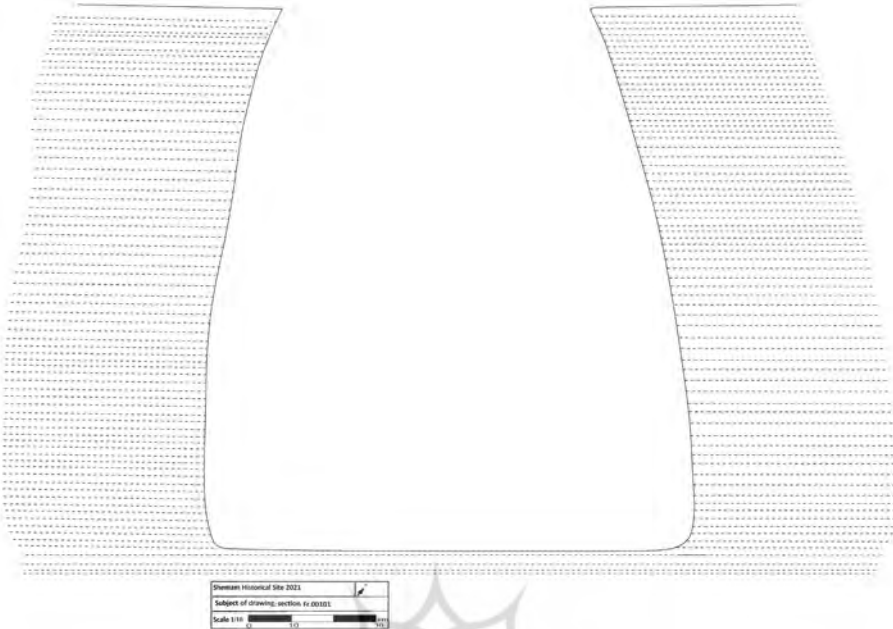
The Section on Storage Pit in Shemam Village (Raof, 2021)
